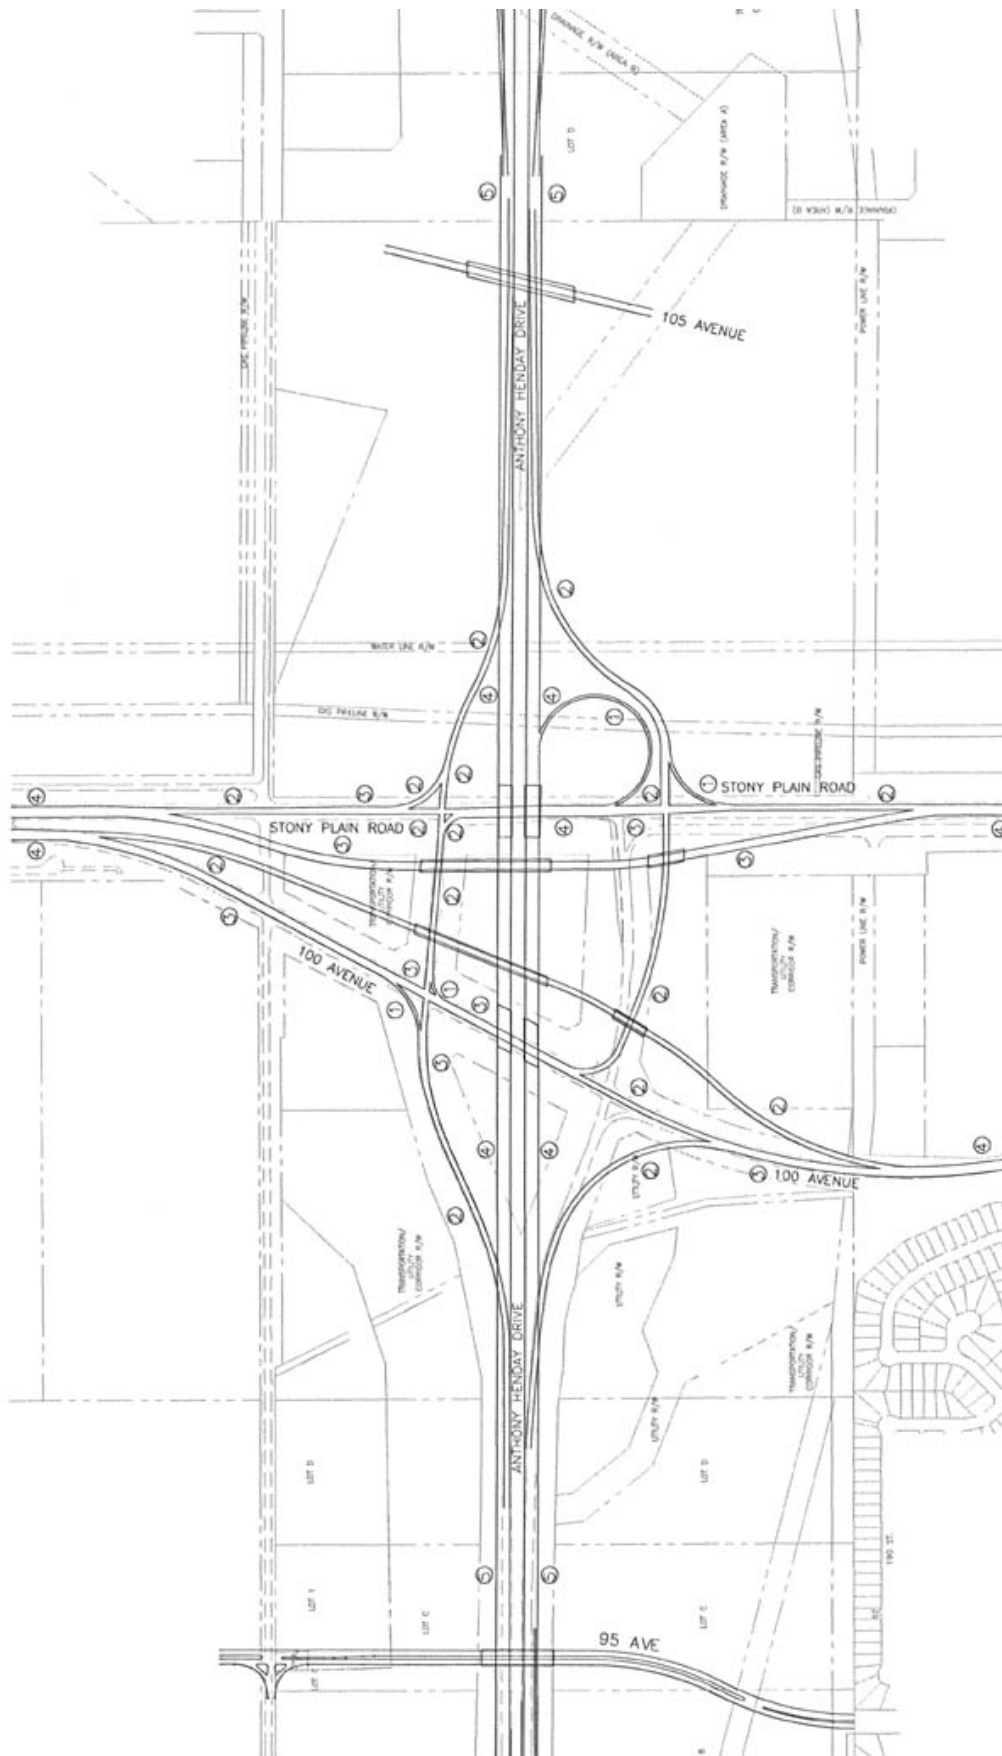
Proposed plan for Anthony Henday Drive Interchange at Stony Plain Road
